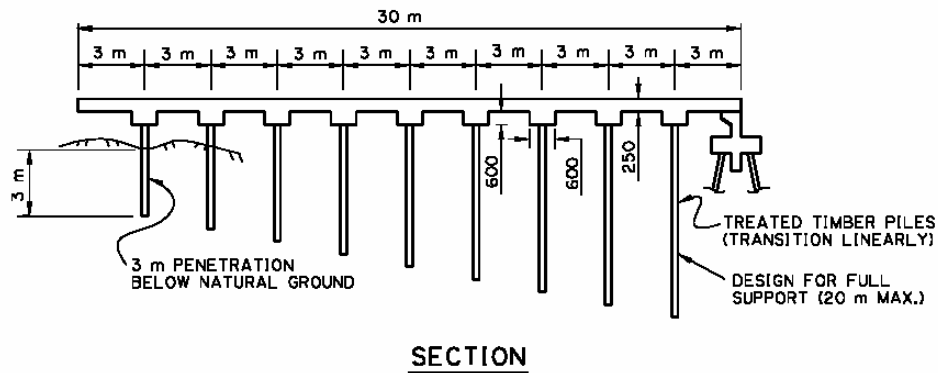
Typical pile-supported approach slab in Louisiana
